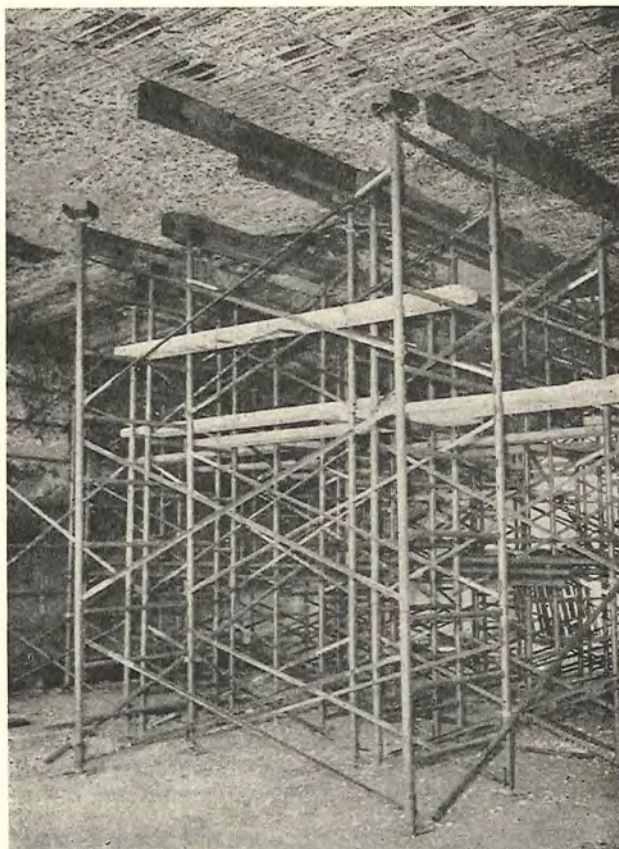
Shepherd Bridge, showing spalling of deck soffit in upstream section, and shoring under the centre section.
